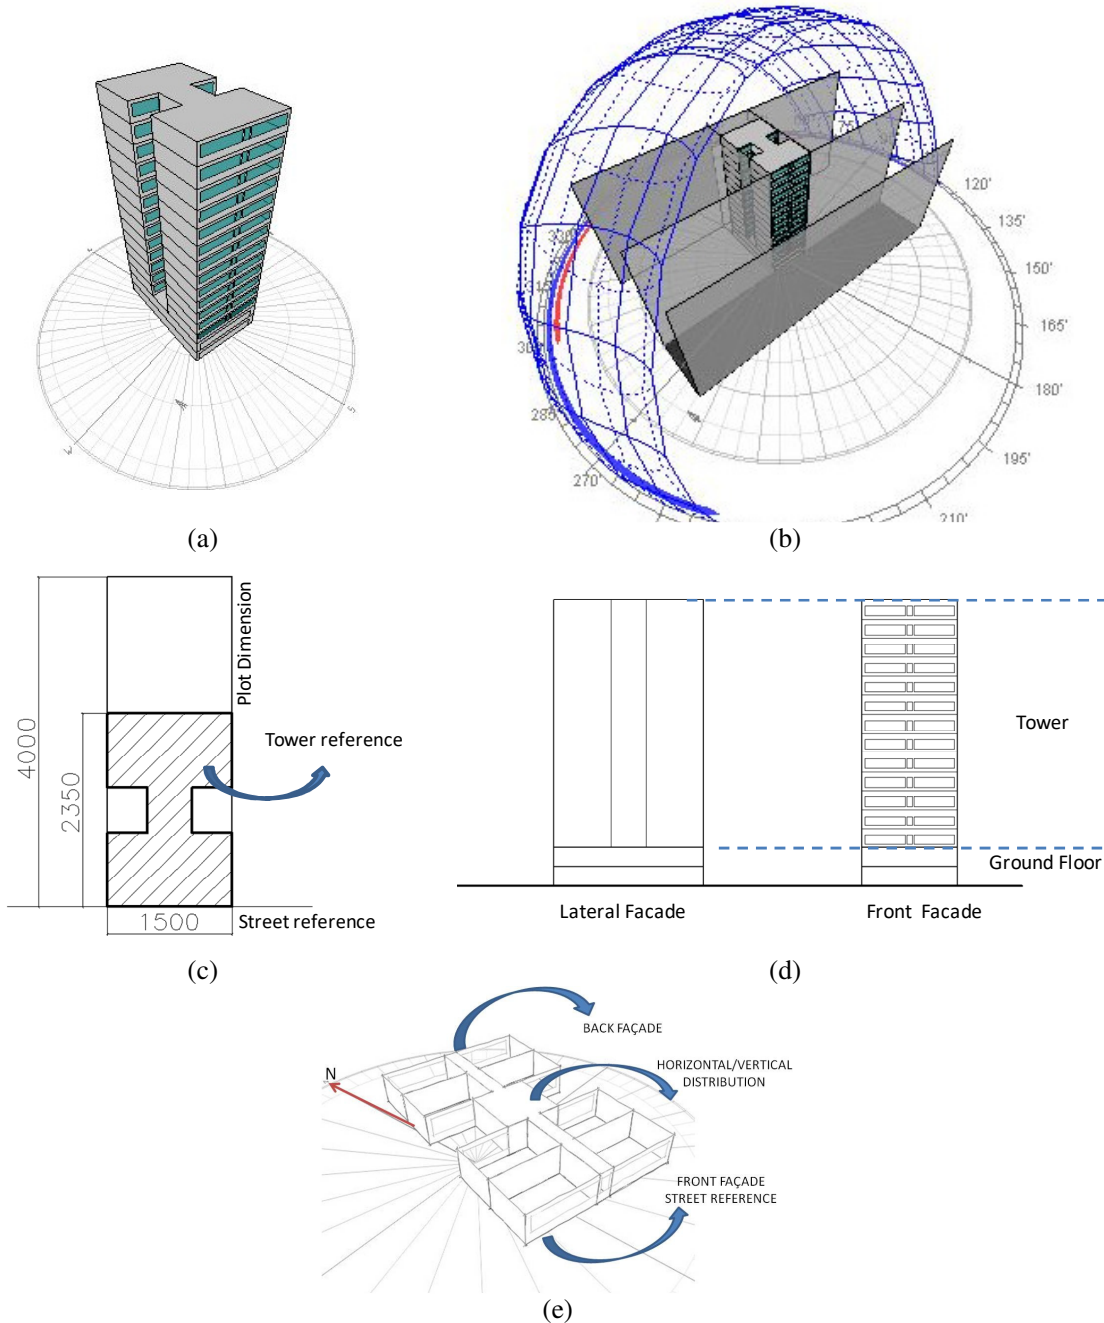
(a) Archetype I geometry, (b) Urban Context, (c) Site plan, (d) Lateral and Front Facade views, (e) Floor Subdivision
